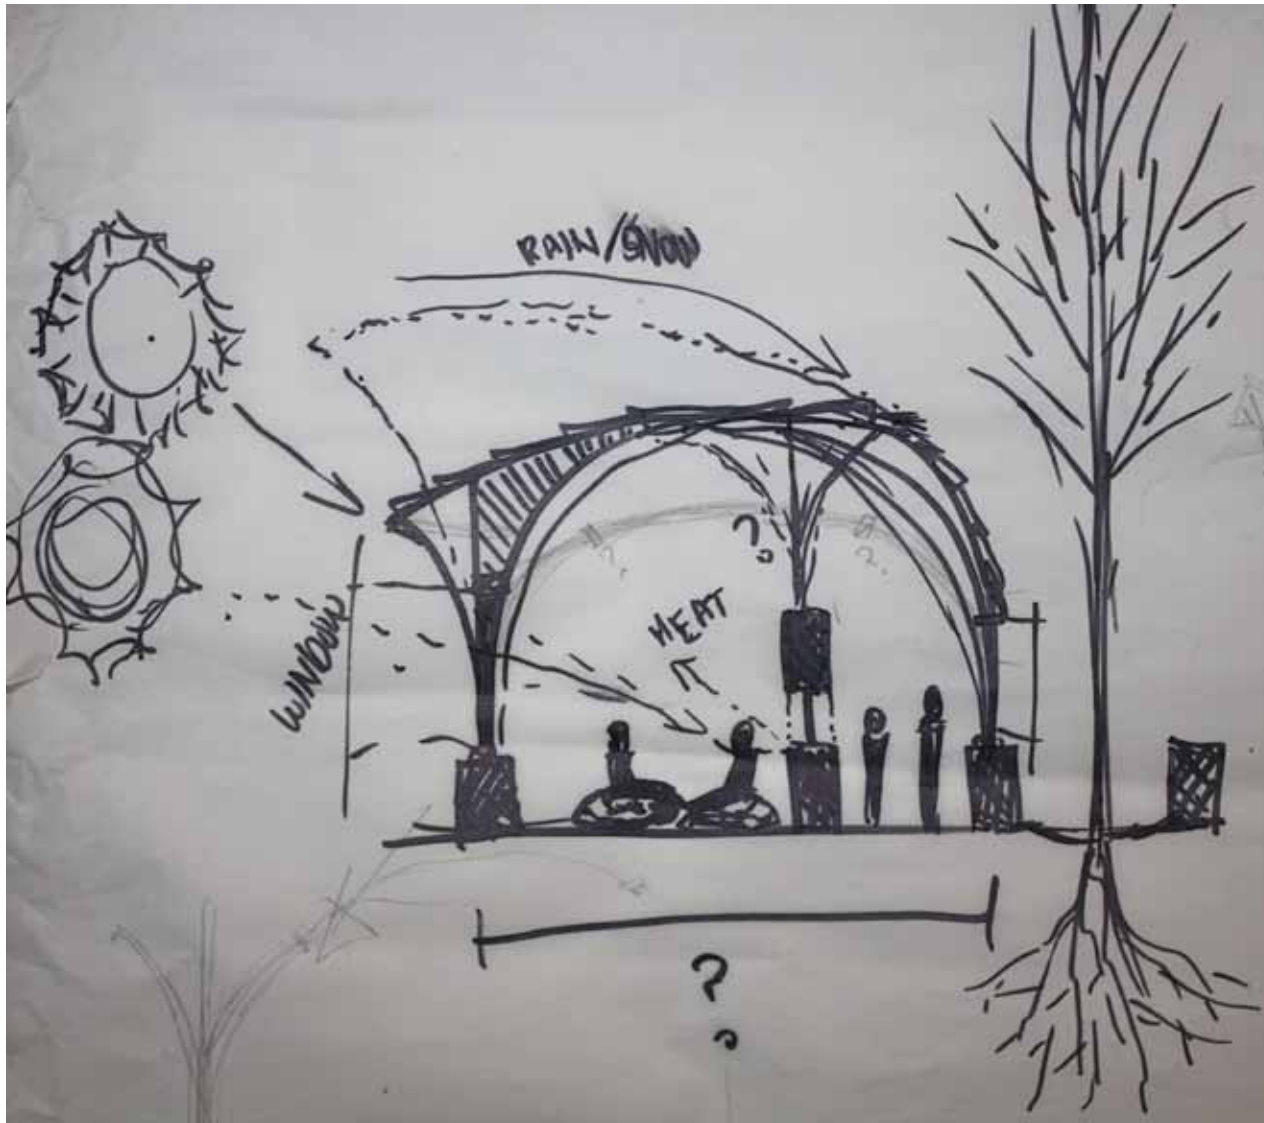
Section based on third plan showing courtyard sliver.
